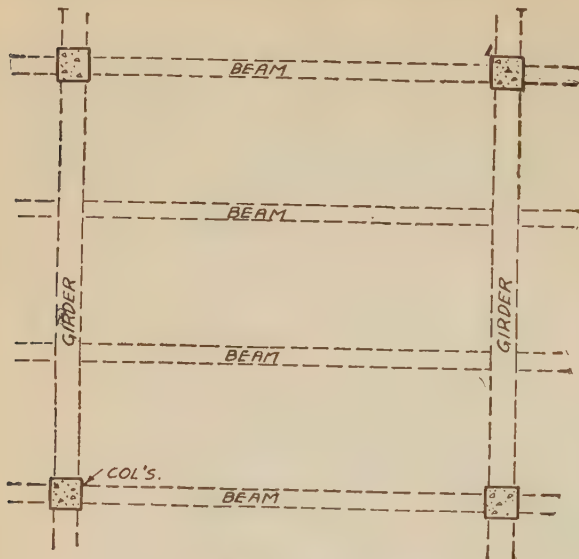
,087.—Am. S. & W. typical panel showing location of beams and girders.
